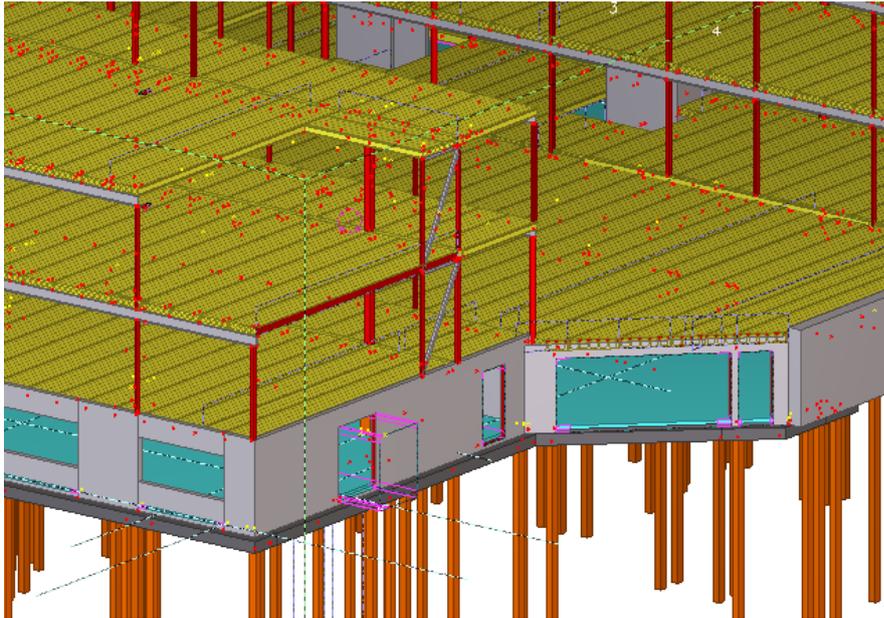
A part of the model created using Tekla. As shown the structural system is concrete cast in situ at the first level on a foundation of foundation piles, and at the other levels hollow core floor elements on a steel structure.
